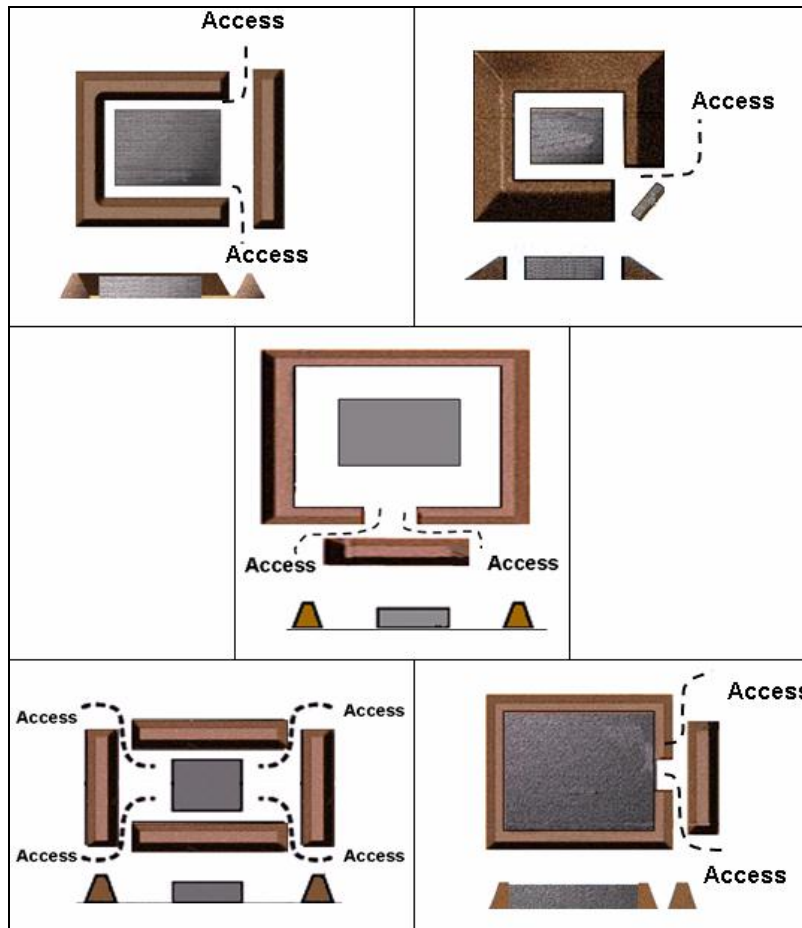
Protecting a Building with Concrete Modular Revetments
